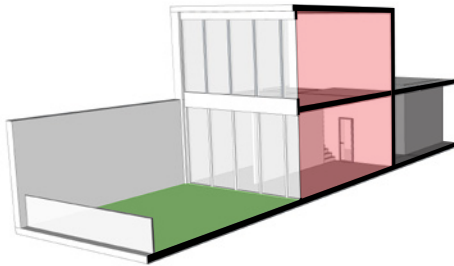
typical 1 - 2 bedroom apartment.
